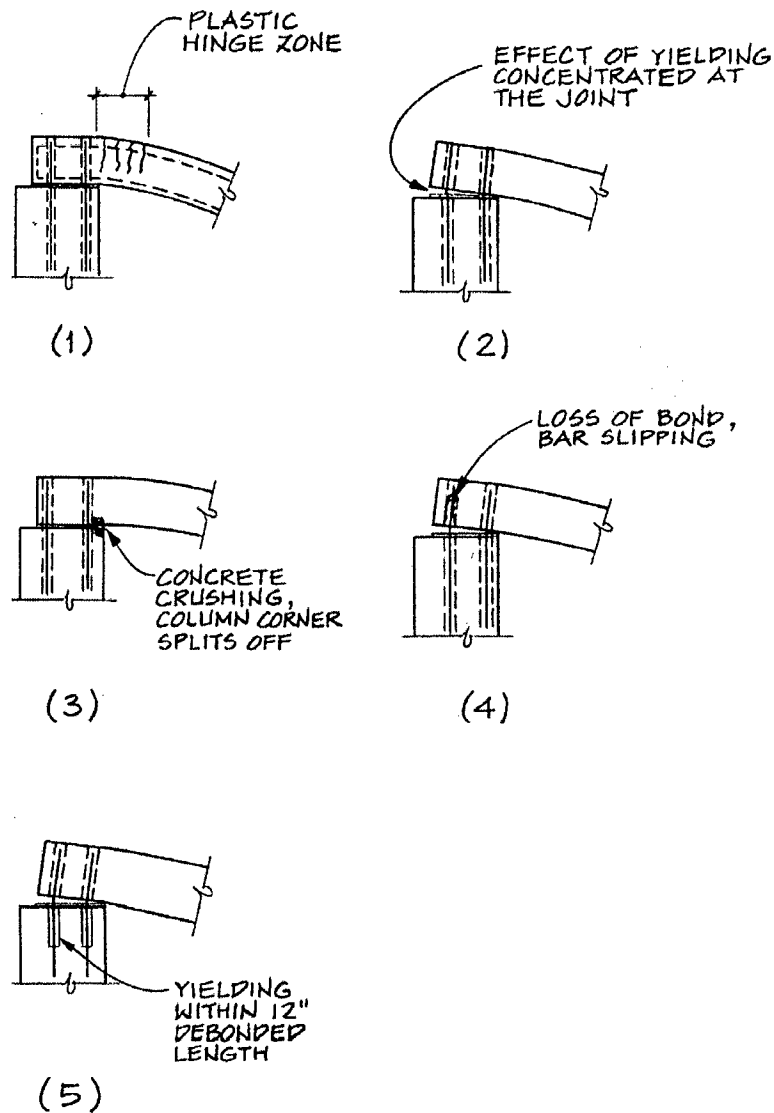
Flexural failure mechanisms for precast connection using grouted ducts
